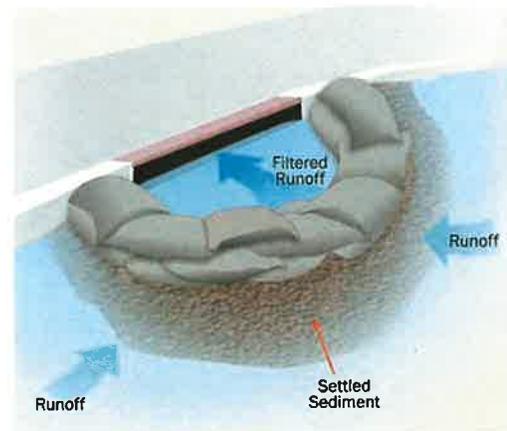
Illustration of a storm drain inlet with rock-filled bags filtering stormwater.
